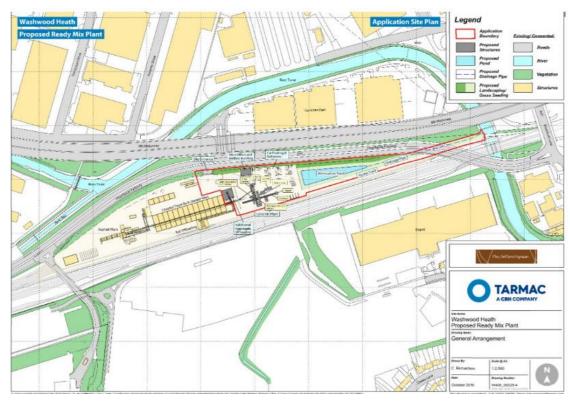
Layout plan for application reference 2020/01195/PA located to the north of the Network Rail tracks and the Washwood Heath Depot site and directly to the east of
